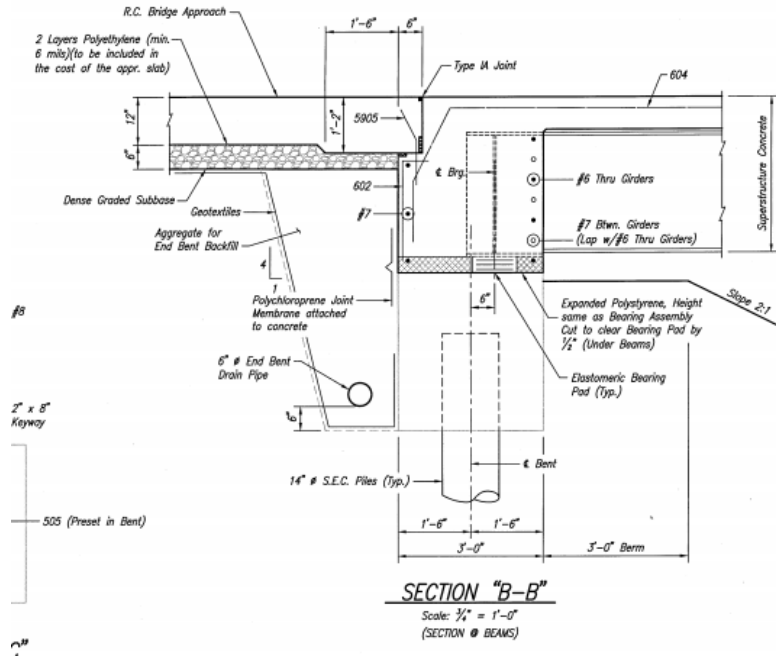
Abutment Detail of the Bridge (NBI 41230) (2015)
